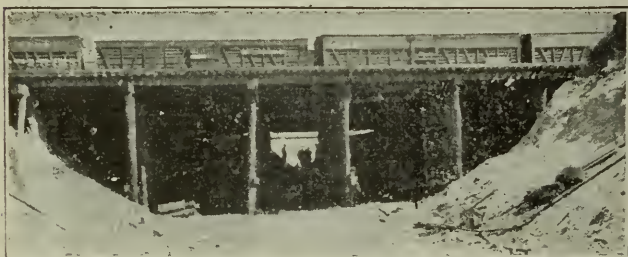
PILE TREESTLE CARRYING TRACKS DURING CONSTRUCTION OF UNDERCROSSING
